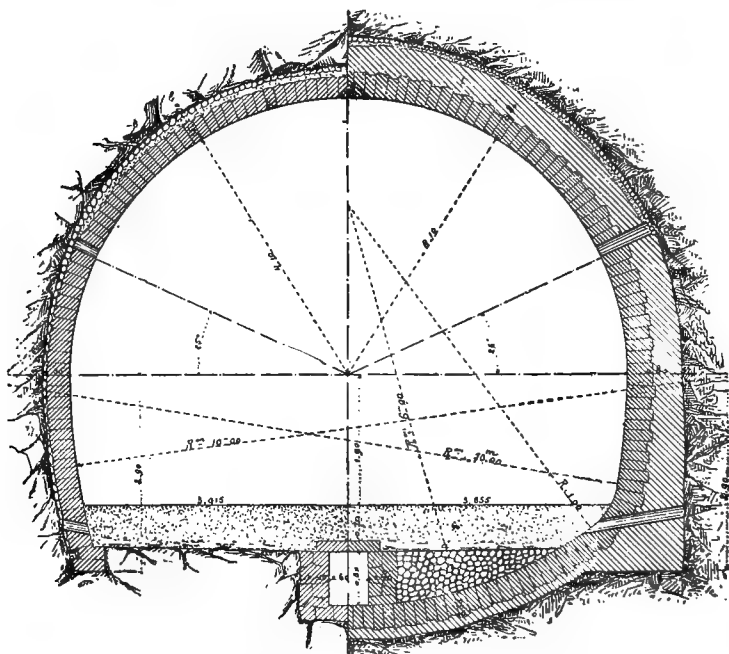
Half sections of the Cabres Pass Tunnel.
